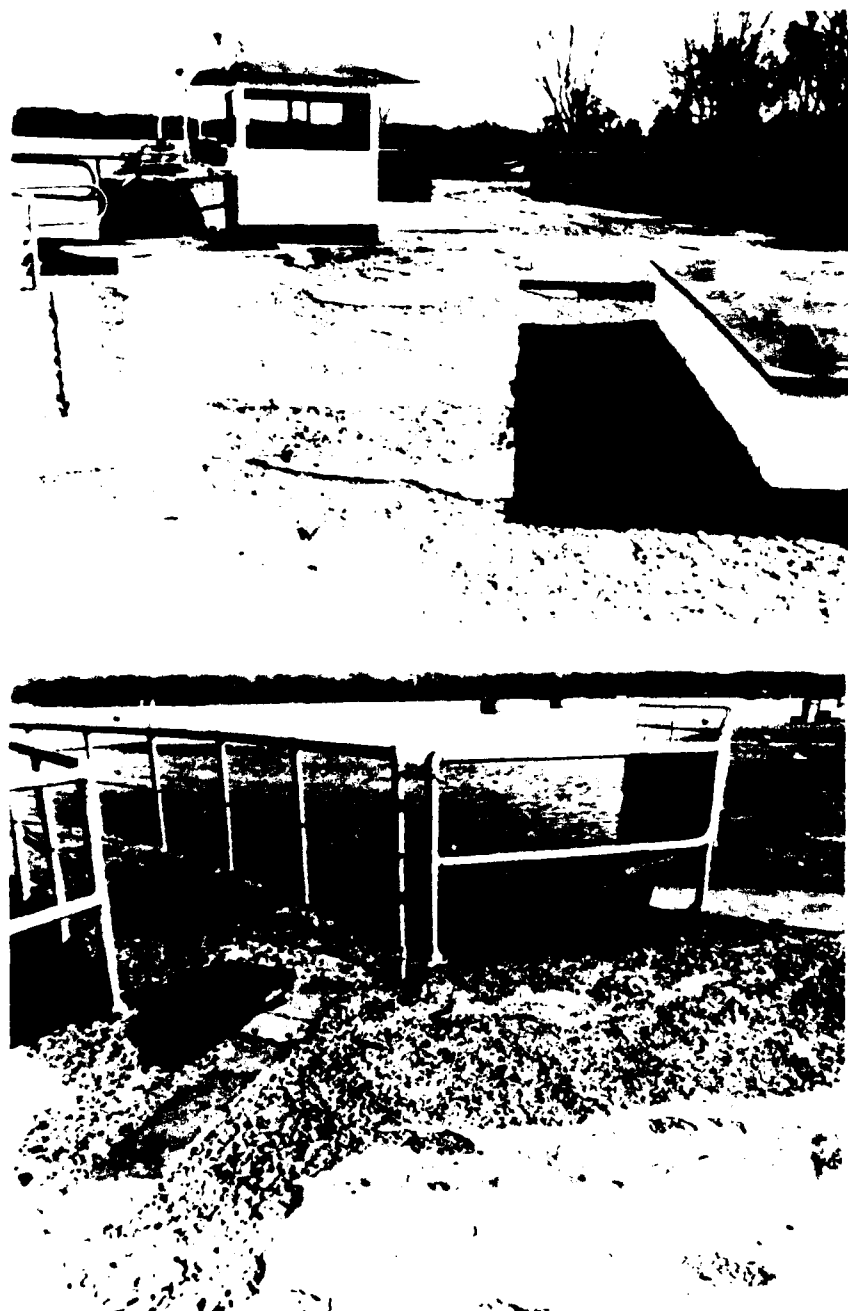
Typical concrete deterioration on tops of lock walls, 1961, Dresden Island Lock and Dam
